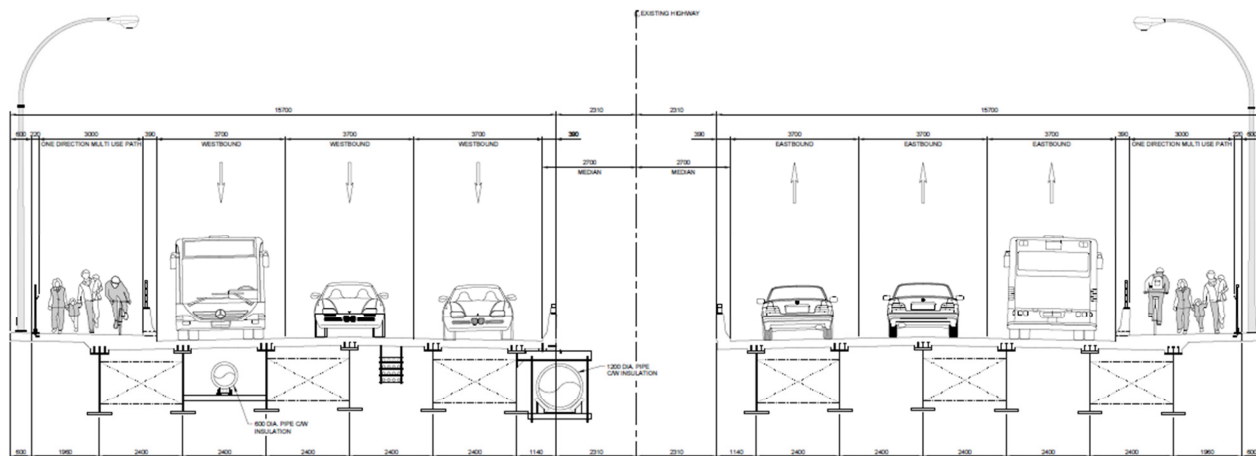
Proposed Coquitlam River Bridge Cross-Section
